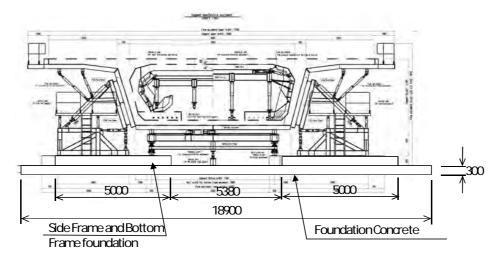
Short Line Equipment Foundation Front View
